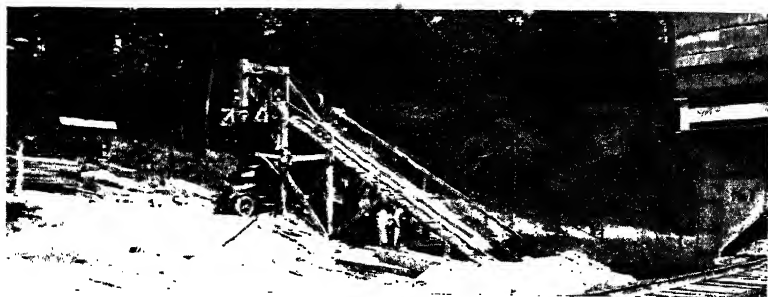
Hopper and slide used for loading trucks at east embankment.
